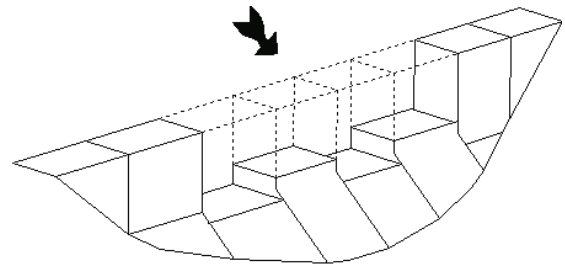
River diversion over the top of alternate lowered blocks in a concrete dam.
